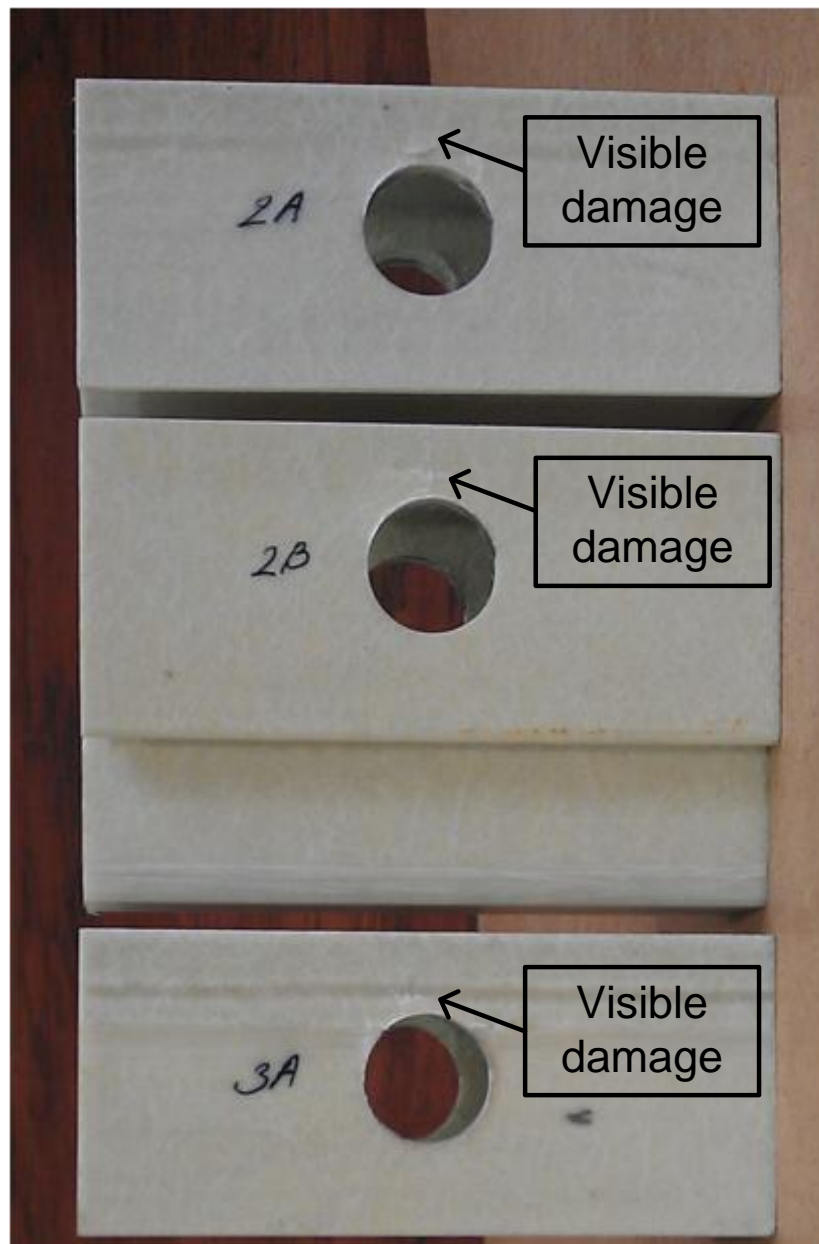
Bearing mode of failure (not necessarily the classical bearing failure owing to material crushing) of stud column section from specimens WU-sc-Tdb-3A, WU-sc-Tdb-2B and WU-sc-Tdb-2A.
